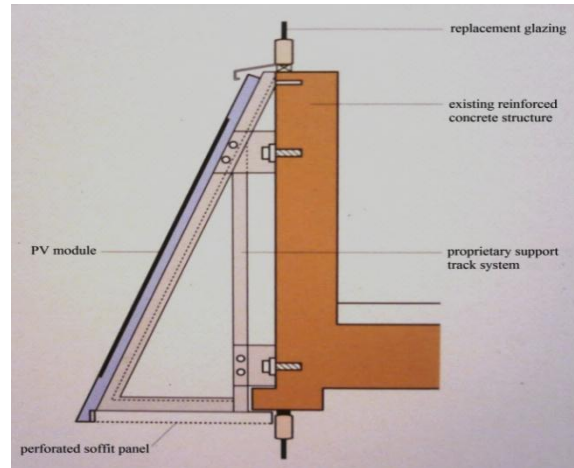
Vertical section through support inclined façade system (Robert and Guariento, 2009).
